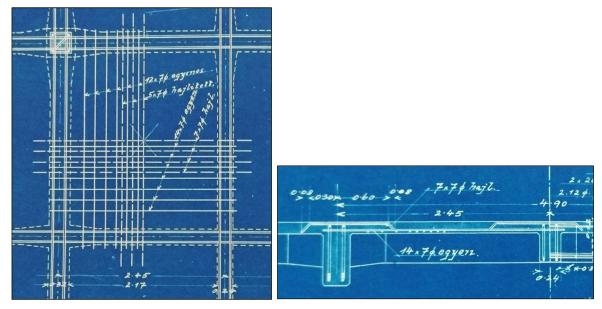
Reinforcement details of the roof slab (bars are labeled as: egyeness - straight, hajlitott - bent) [5]
